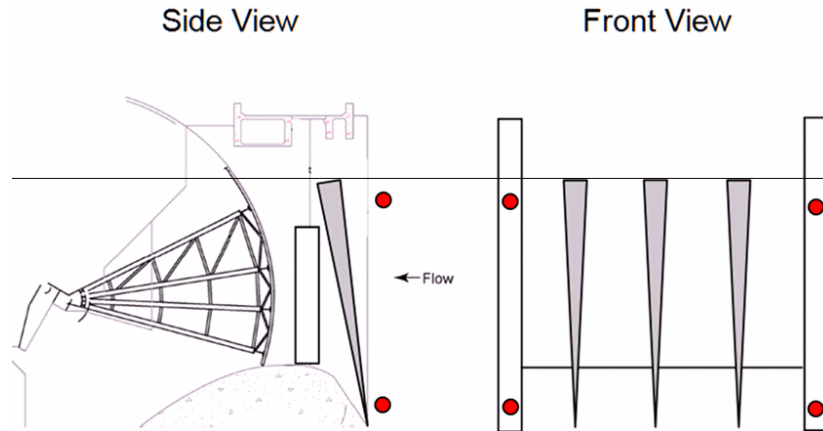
Diagram illustrating the location of JSATS hydrophones (red dots) on spill bay piers in side view (left) and front view (right). Horizontal separation of nodes at the same elevation would be 62 ft. Vertical separation of nodes on the same pier would be about 50 ft.
